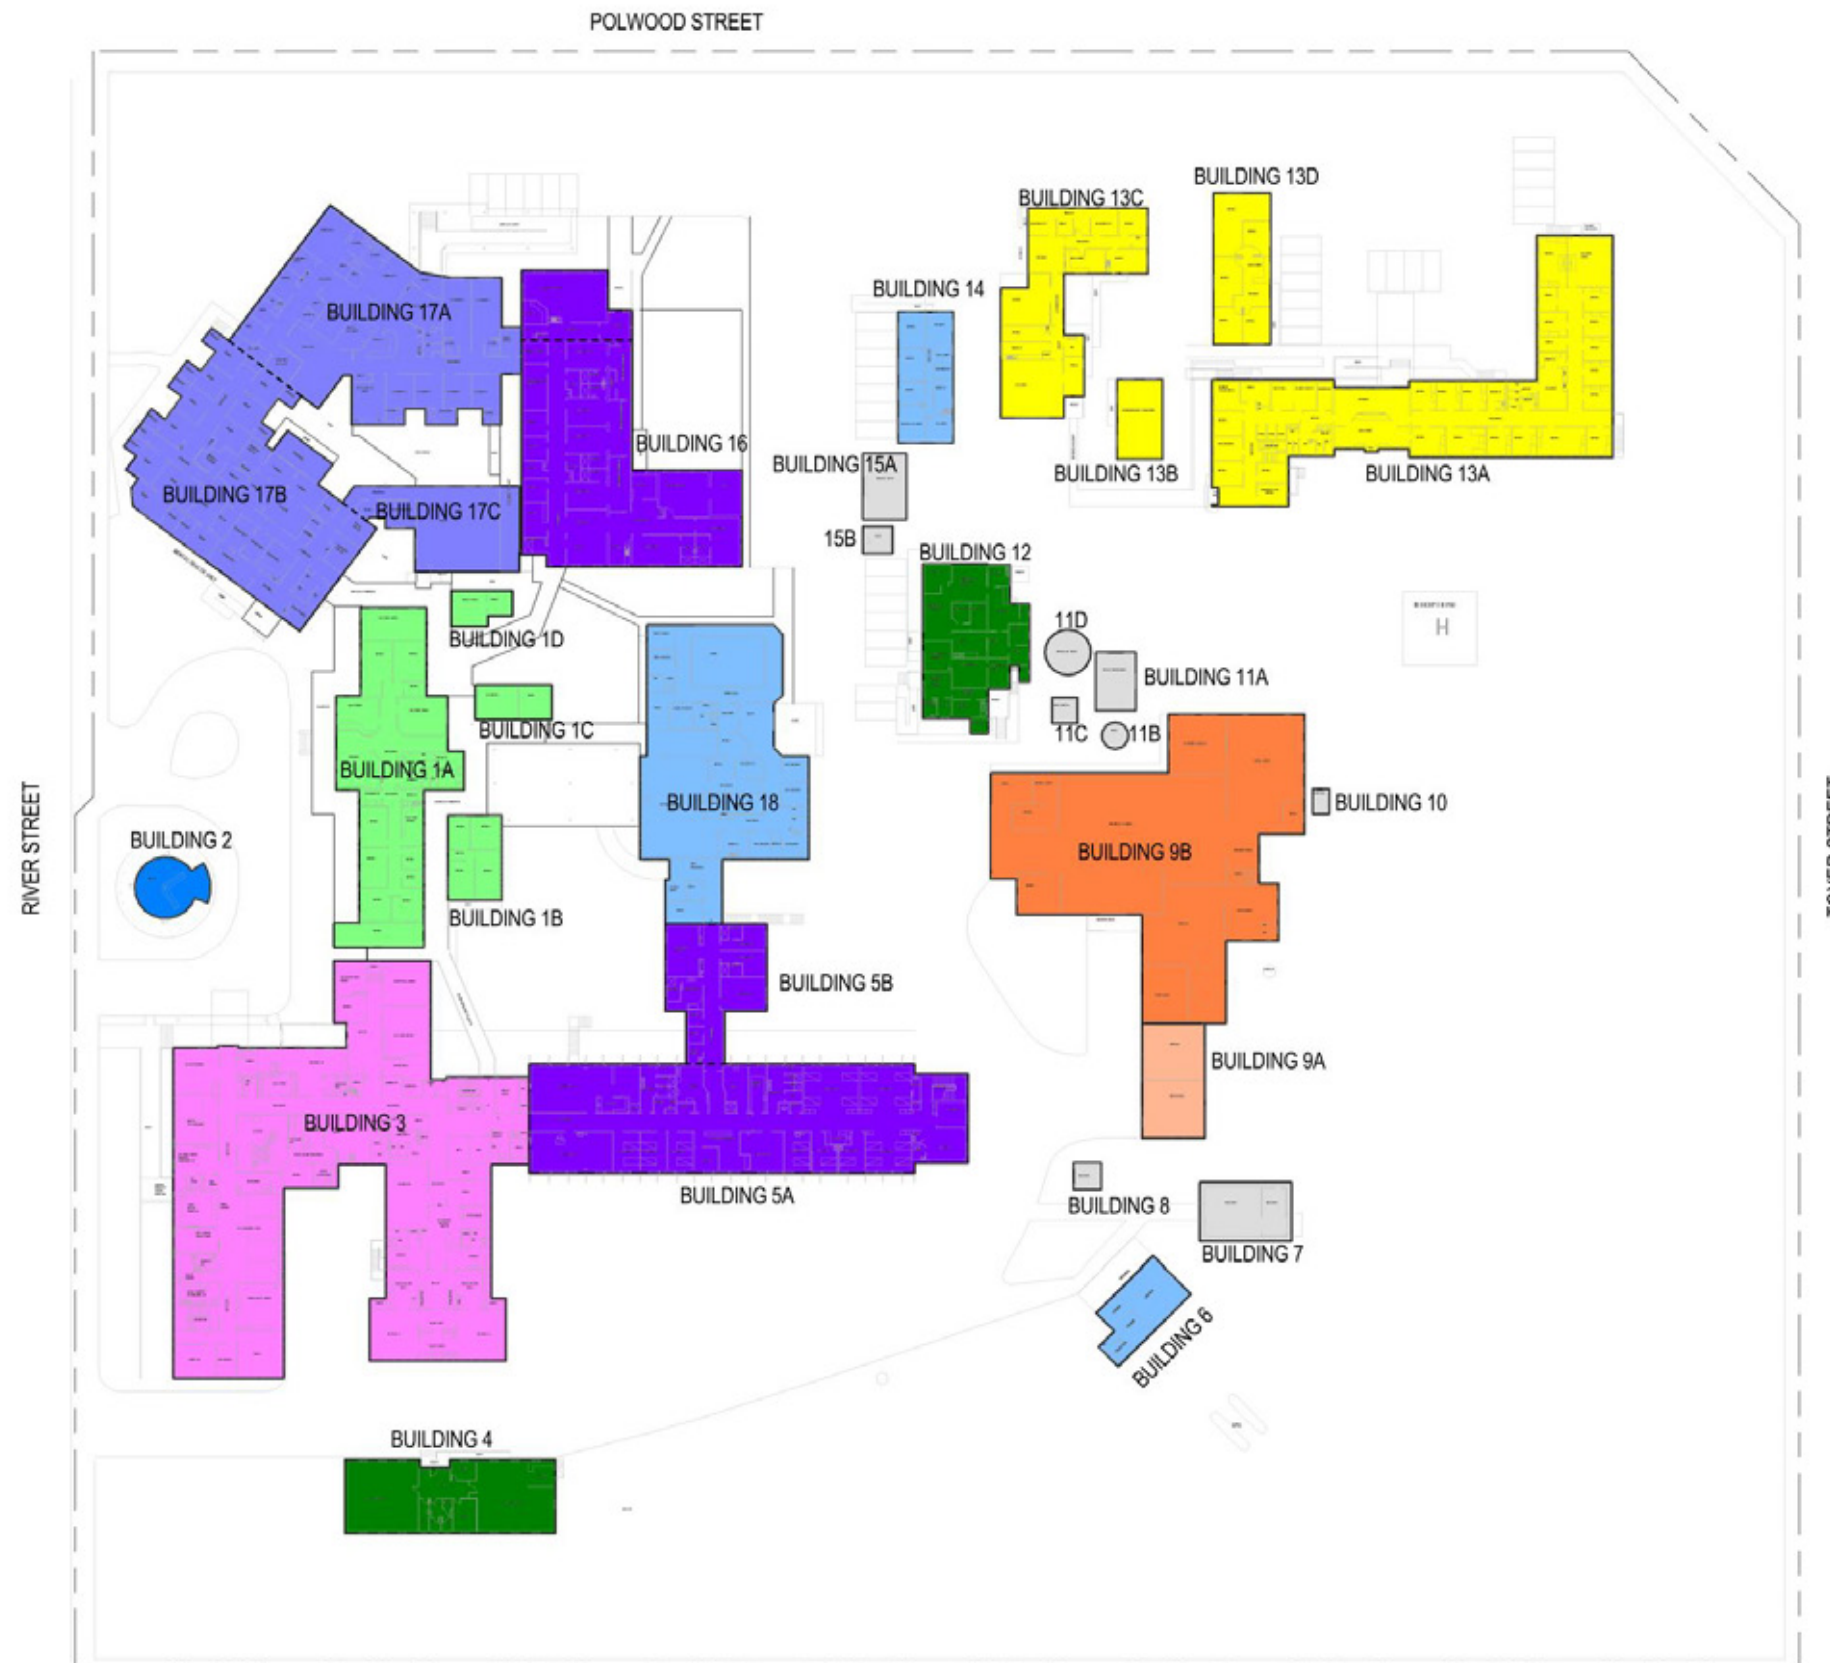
Site Plan showing arrangement of Existing Hospital Buildings
